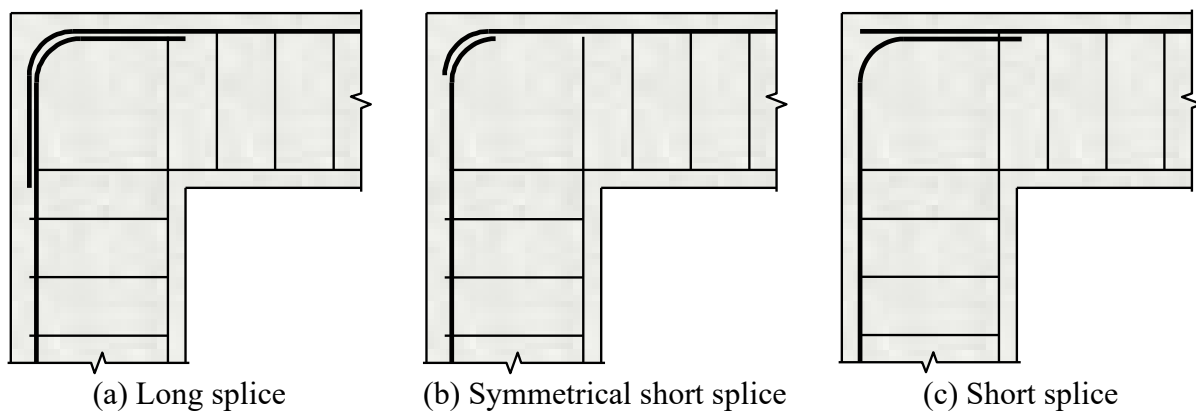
Splice details (adapted from Lundgrnen¹¹)
